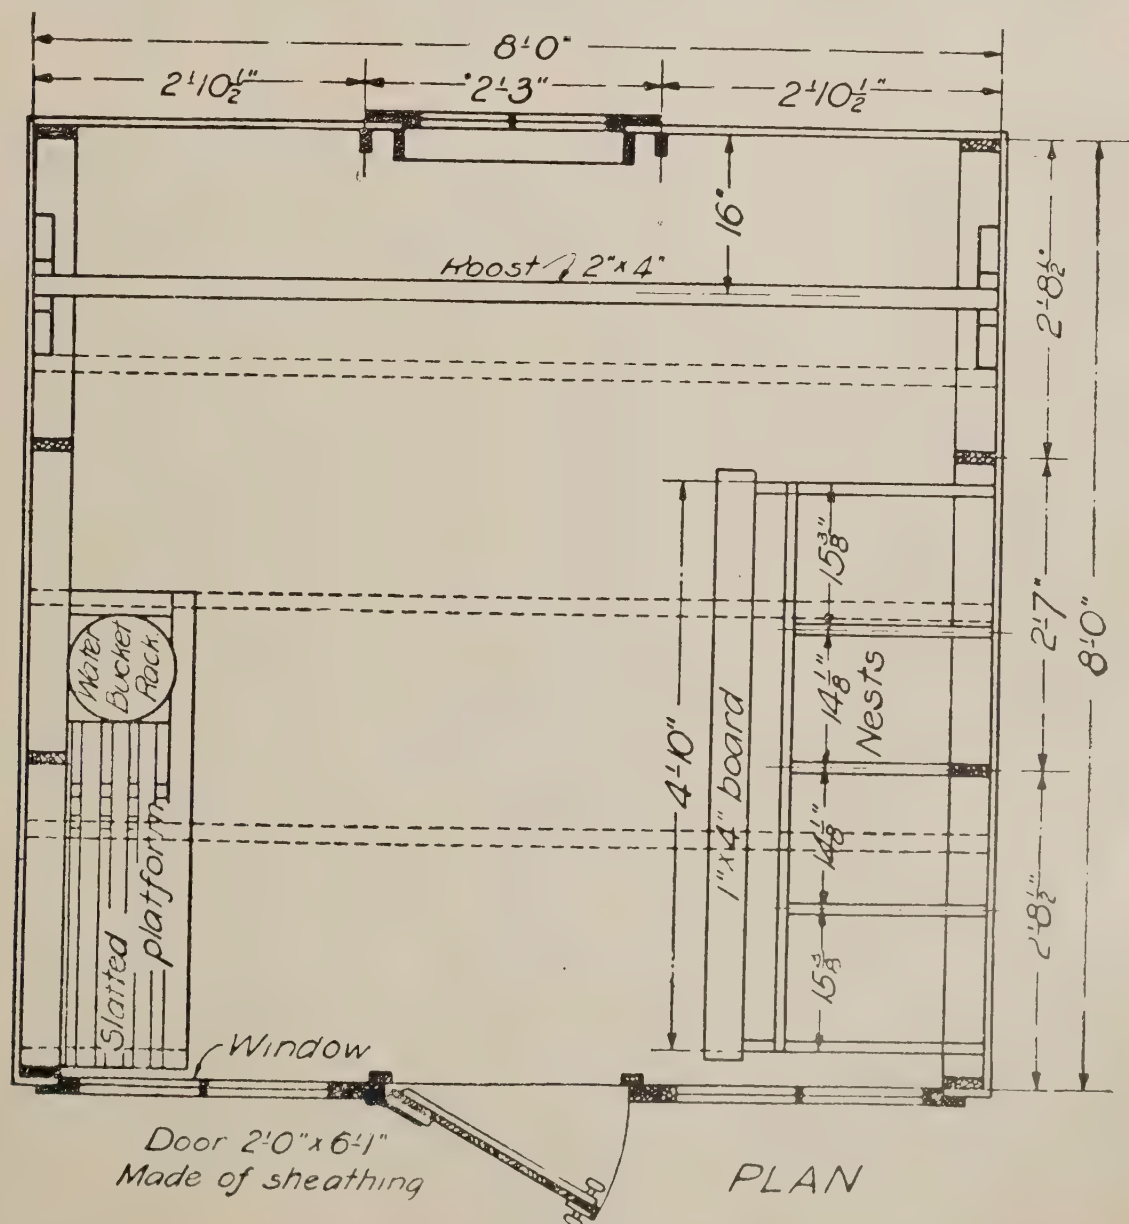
Floor plan of house shown in Fig 10 when used for laying hen .
